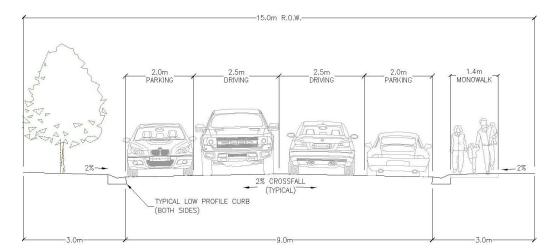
Typical Internal Road Cross-Section – Urban Residential (400.1)
